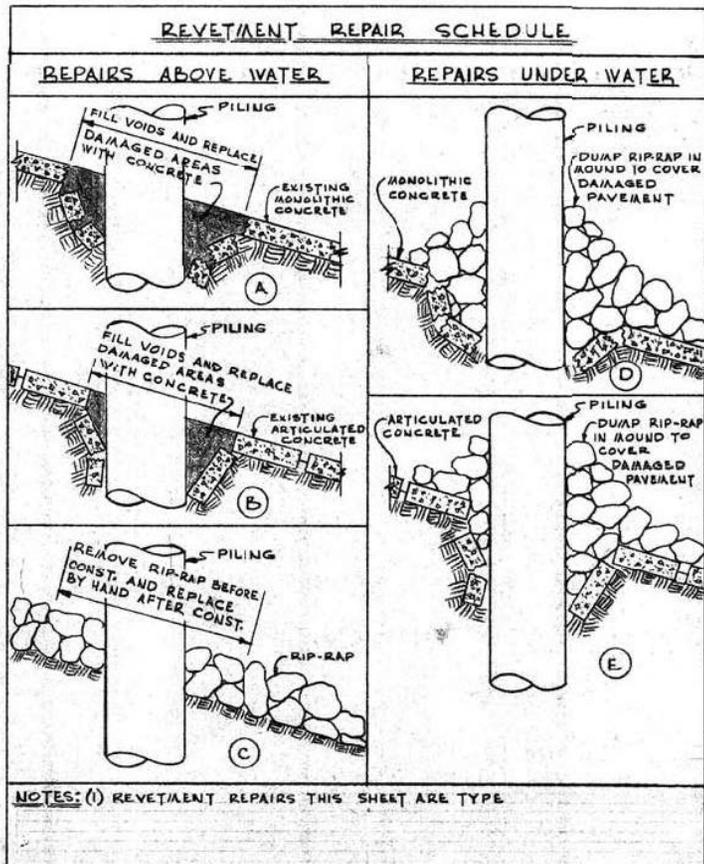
Proposed Section 408 project features, Consolidated Grain and Barge, East Prairie, MO. showing support of revetment repairs.
